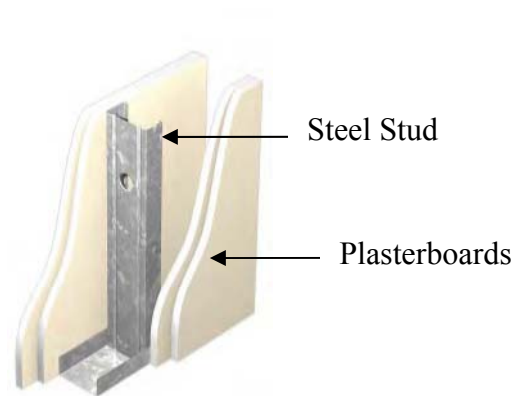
LSF Wall with Gypsum Plasterboard Lining
